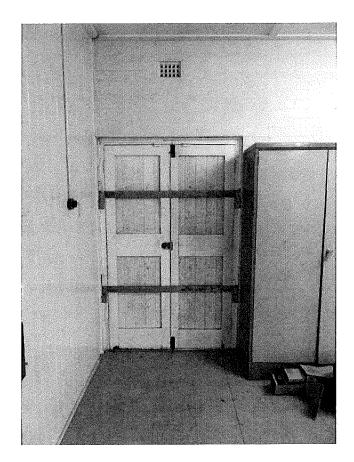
ACMA Facility Main Building interior communications room double doors.
